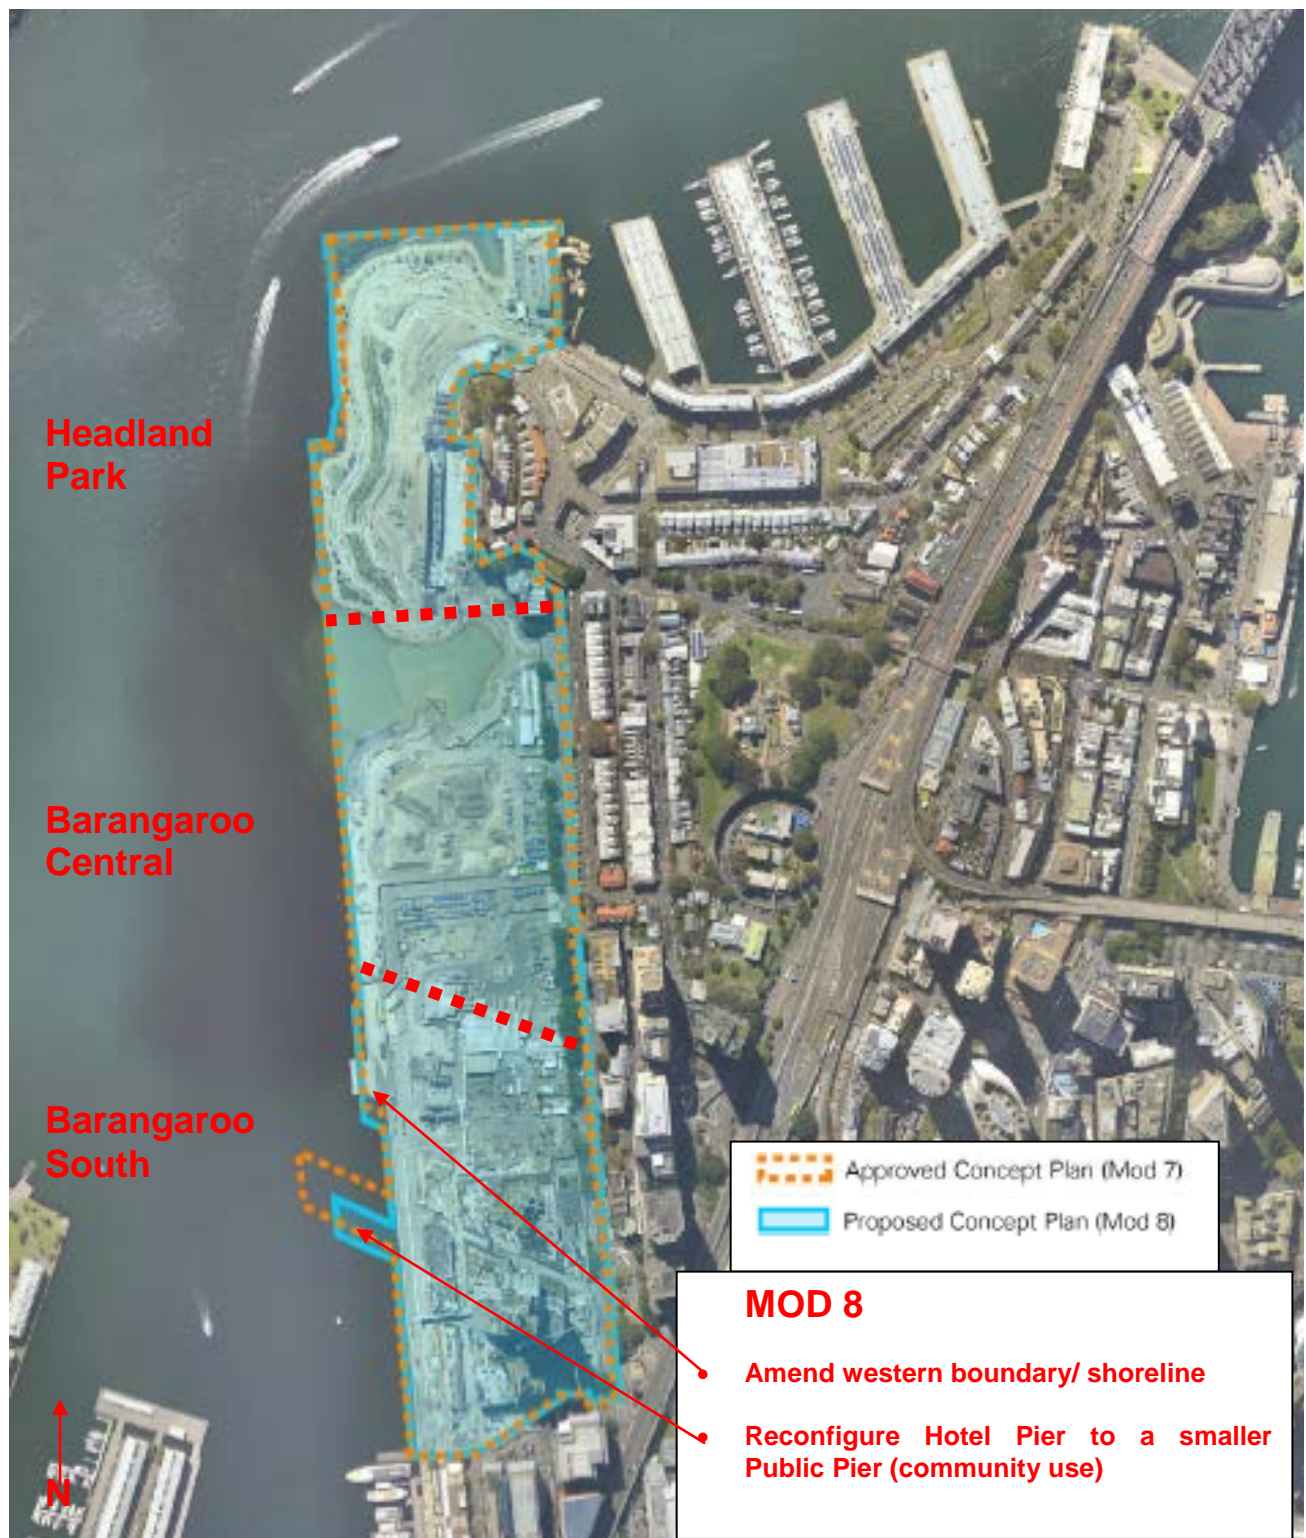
Approved Barangaroo Site Boundary - Concept Plan (MOD 7) and proposed Concept Plan (MOD 8) (Source: JBA)
